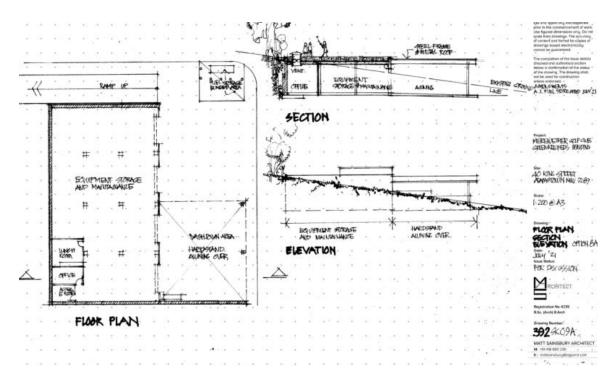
Concept Option 8A - Floor Plan and Section Elevation
